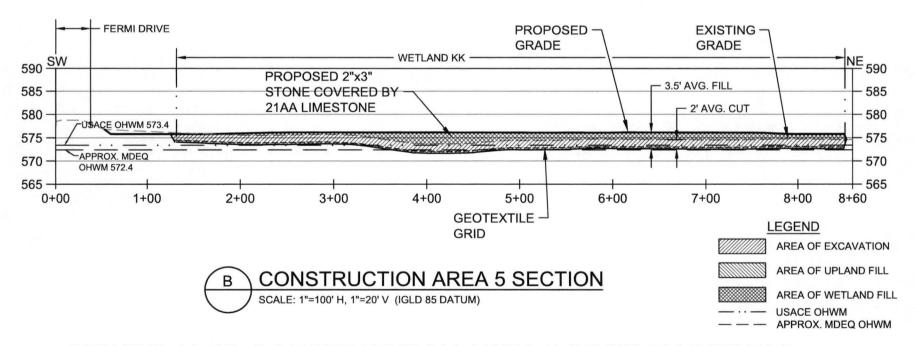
B CONSTRUCTION AREA 5 SECTION DETAILS
